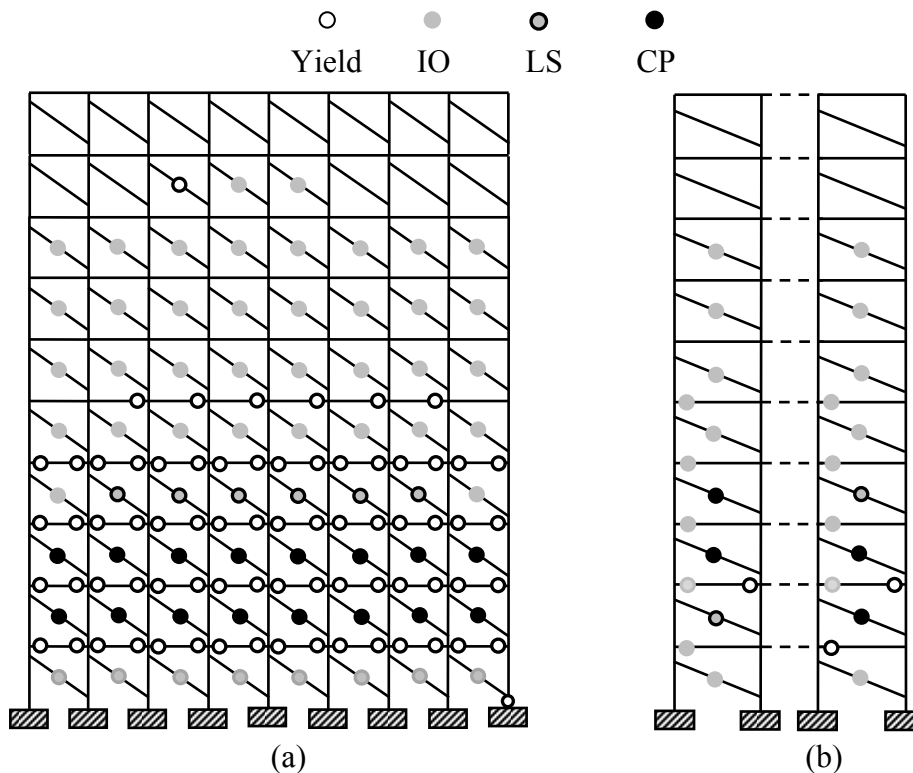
Collapse mechanism of ten storey RC frame building with URM infills, designed as SMRF as per relevant Indian Standards: (a) typical longitudinal frame; (b) typical transverse frame.
